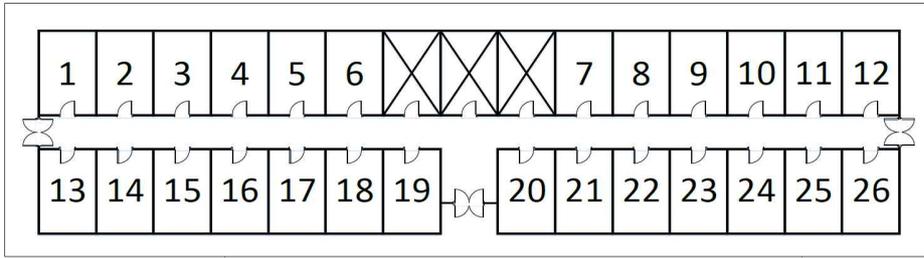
2 CO barracks possible layout (1-floor double corridor)
